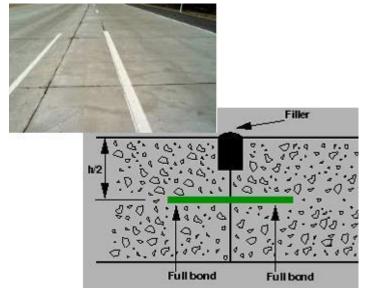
illustrates a contraction joint seen in a cement concrete pavement.
